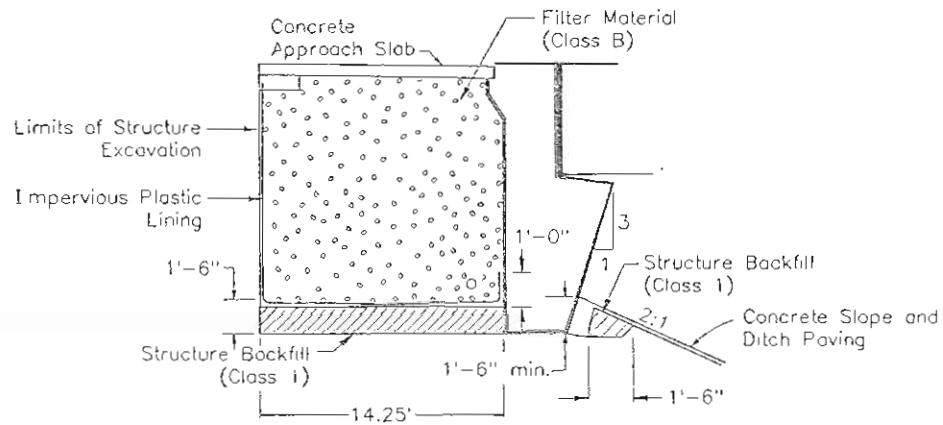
DETAILS OF BACKFILL AT BRIDGE ABUTMENTS
